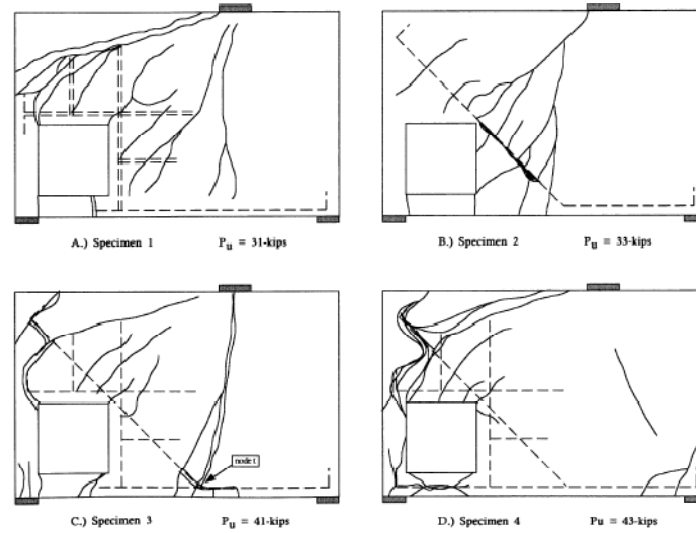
Crack patterns for the reinforcement layout shown on Figure 1-5. (Adapted from Maxwell and Breen, 2000)
